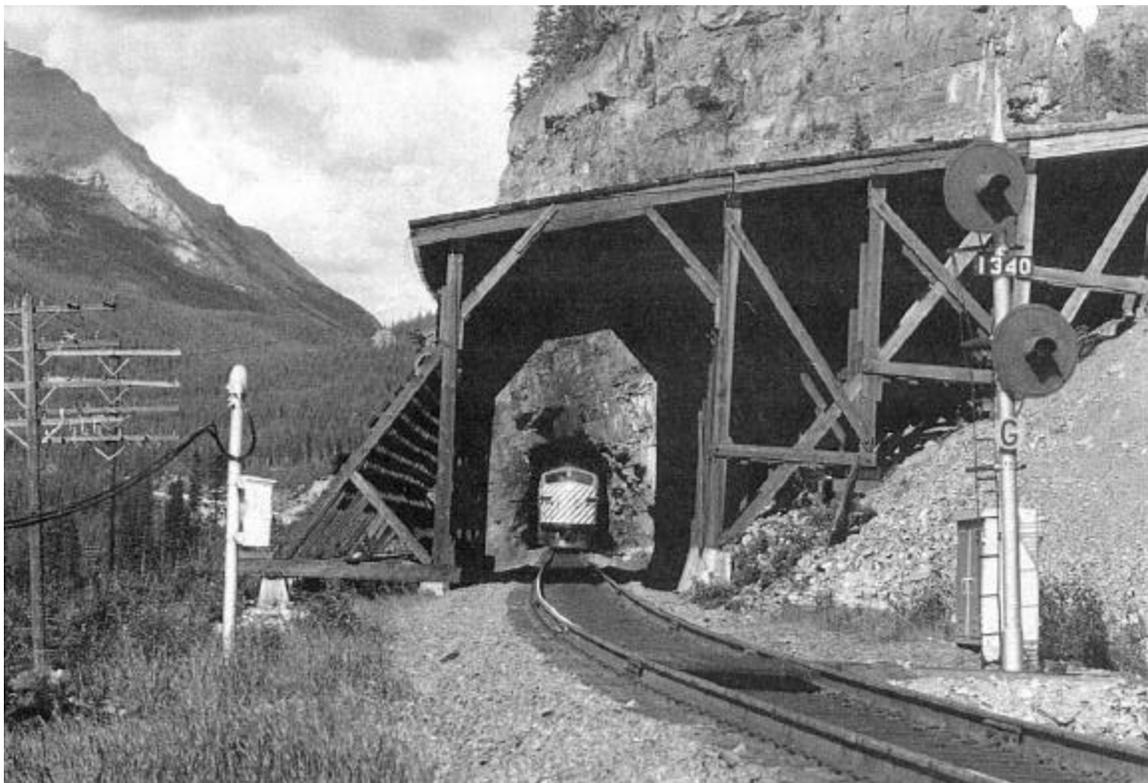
Looking west towards Mile 134 timber shed, circa. early 1970's
